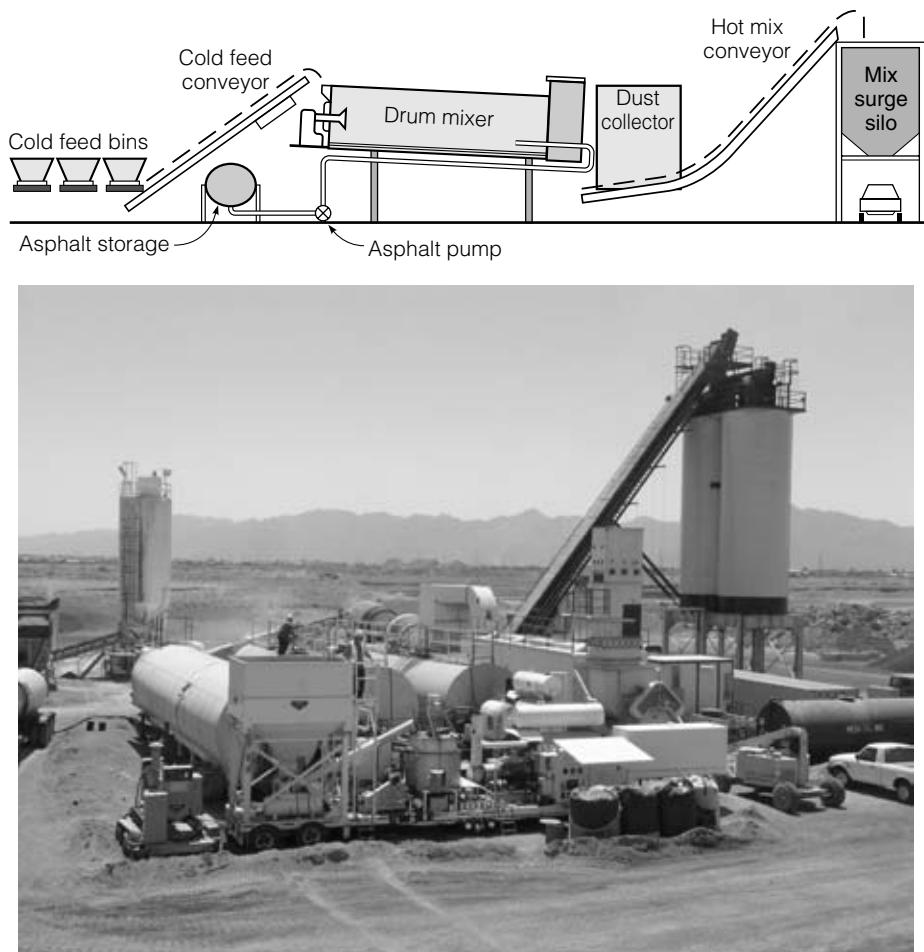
Continuous (drum) mix asphalt concrete plant.
